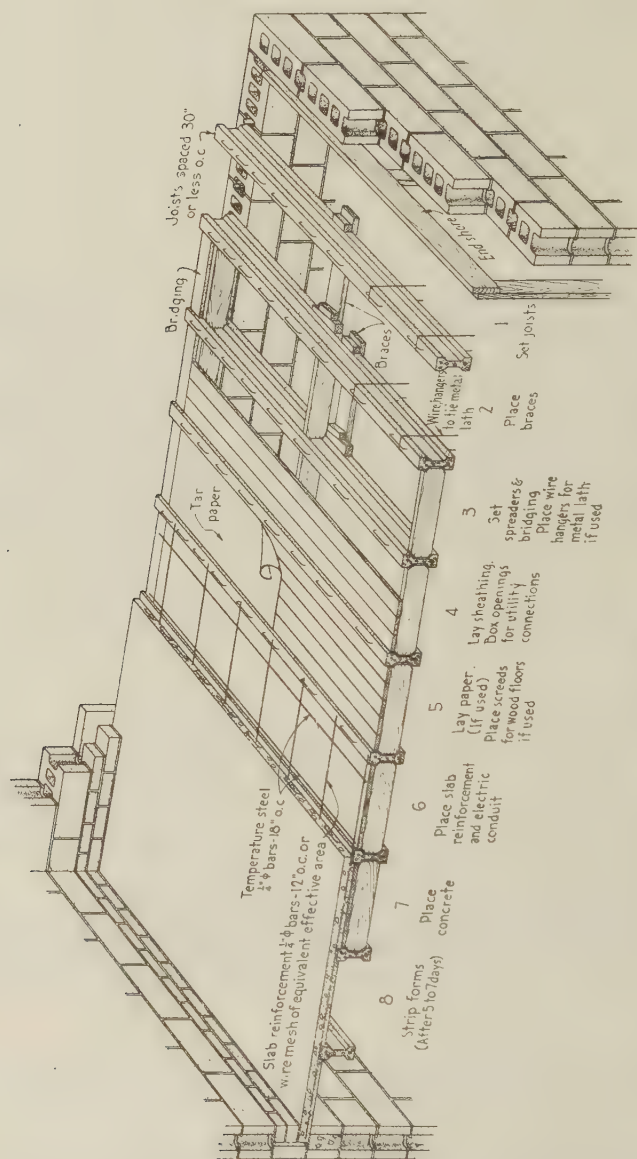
PRECAST CONCRETE JOIST FLOOR CONSTRUCTION IN PERSPECTIVE
